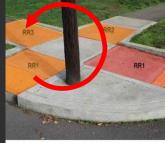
The ramp runs for Curb Ramp 1 System highlighted in
